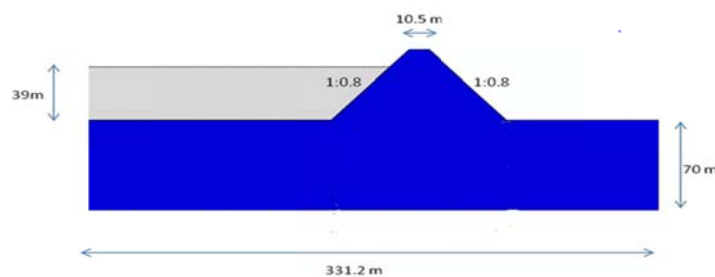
Dimensions of the tallest monolith of Toubetsu Dam
